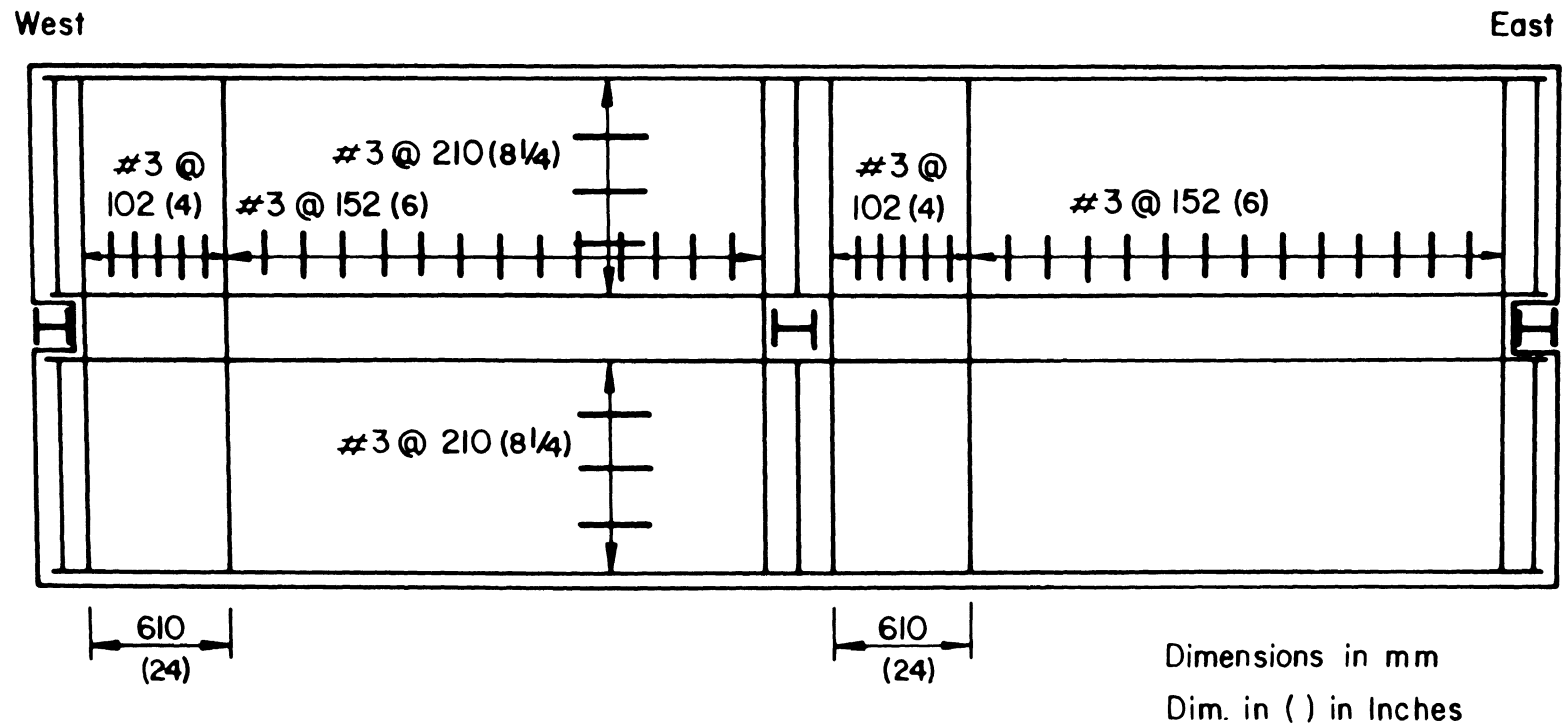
Top Layer of Reinforcement of CA-1 and CA-2
